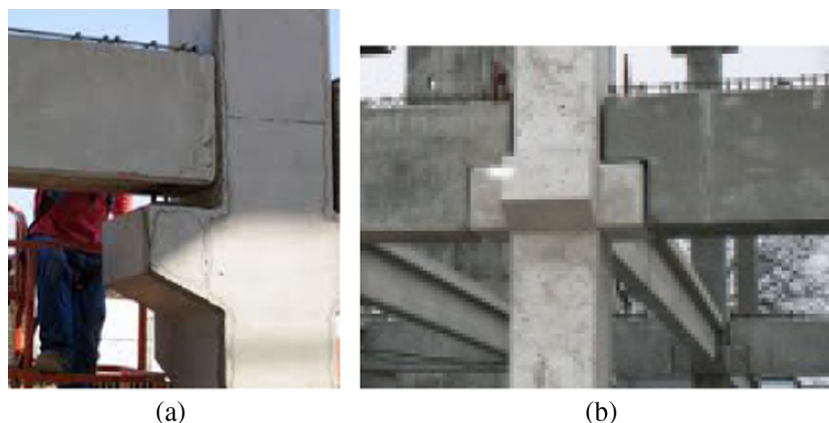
Typical precast RC beam-column connections in buildings of Saudi Arabia: (a) Precast connection type-A; (b) Precast connection type-B.
